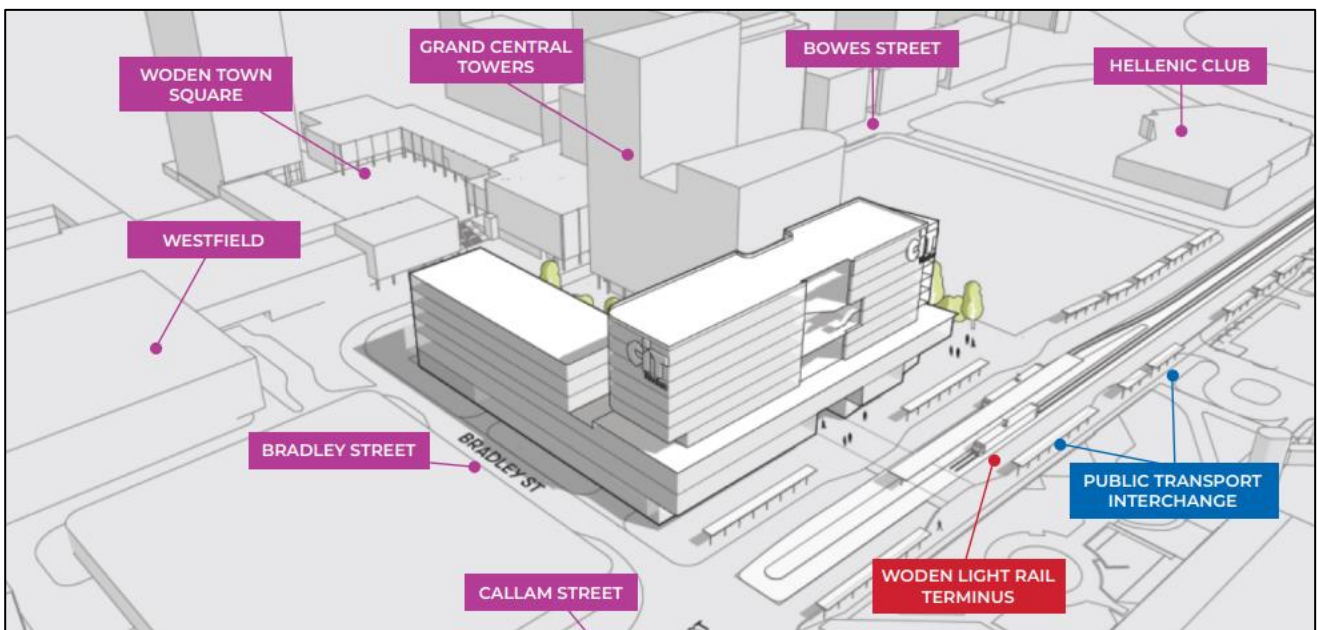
Early design concept of CIT building and surrounding environment (Source: ACT Government)
